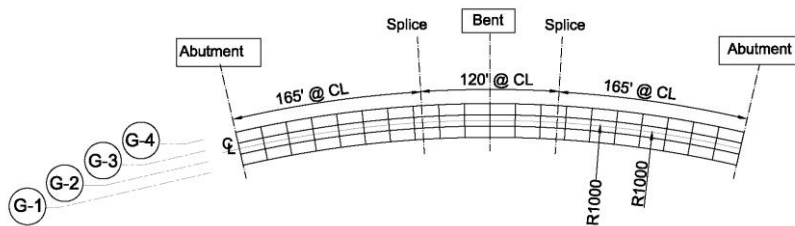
Simplified Framing Plan, Bridge C9: Two-Span, 4-Girder, 304.8 m Radius, R/L=44.4
